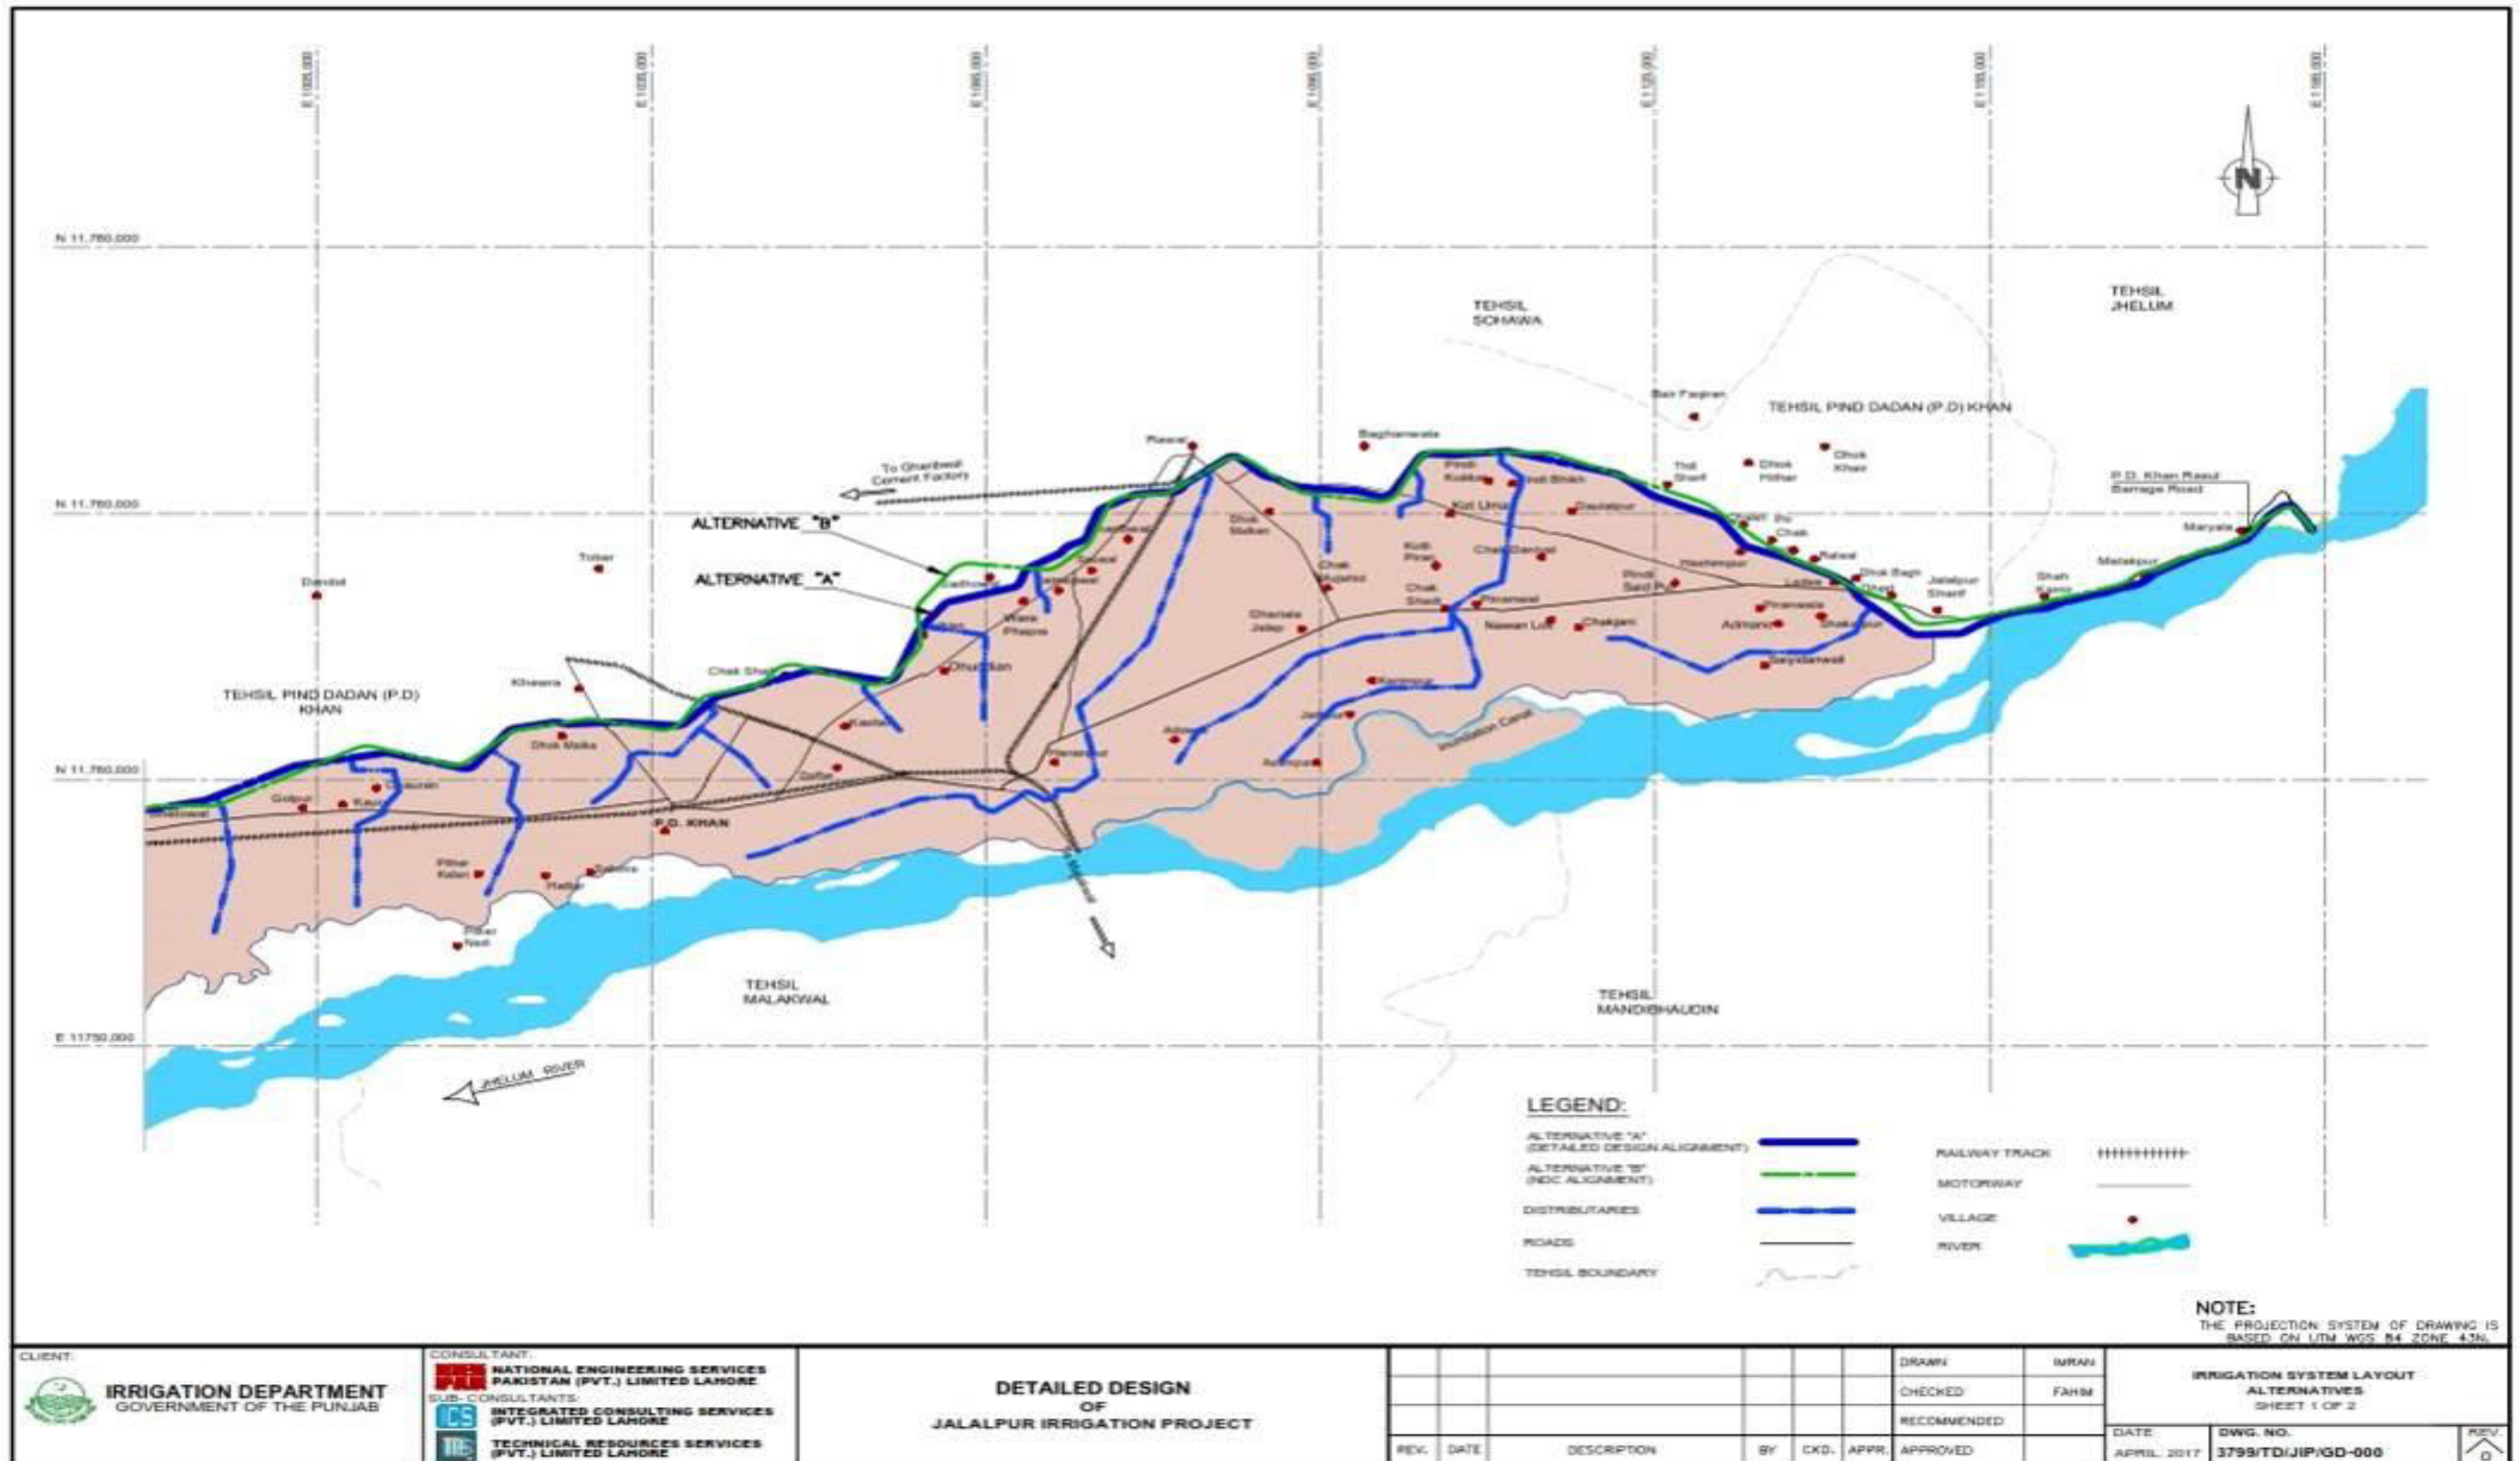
Irrigation System Layout Alternatives A & B – Sheet 1
